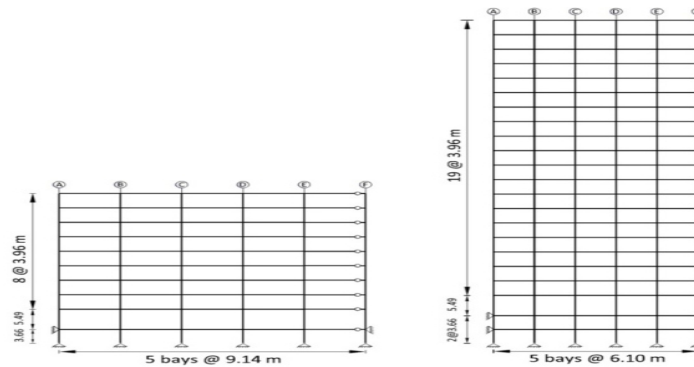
Elevation of the 9-story and 20-story moment-resisting building frames
